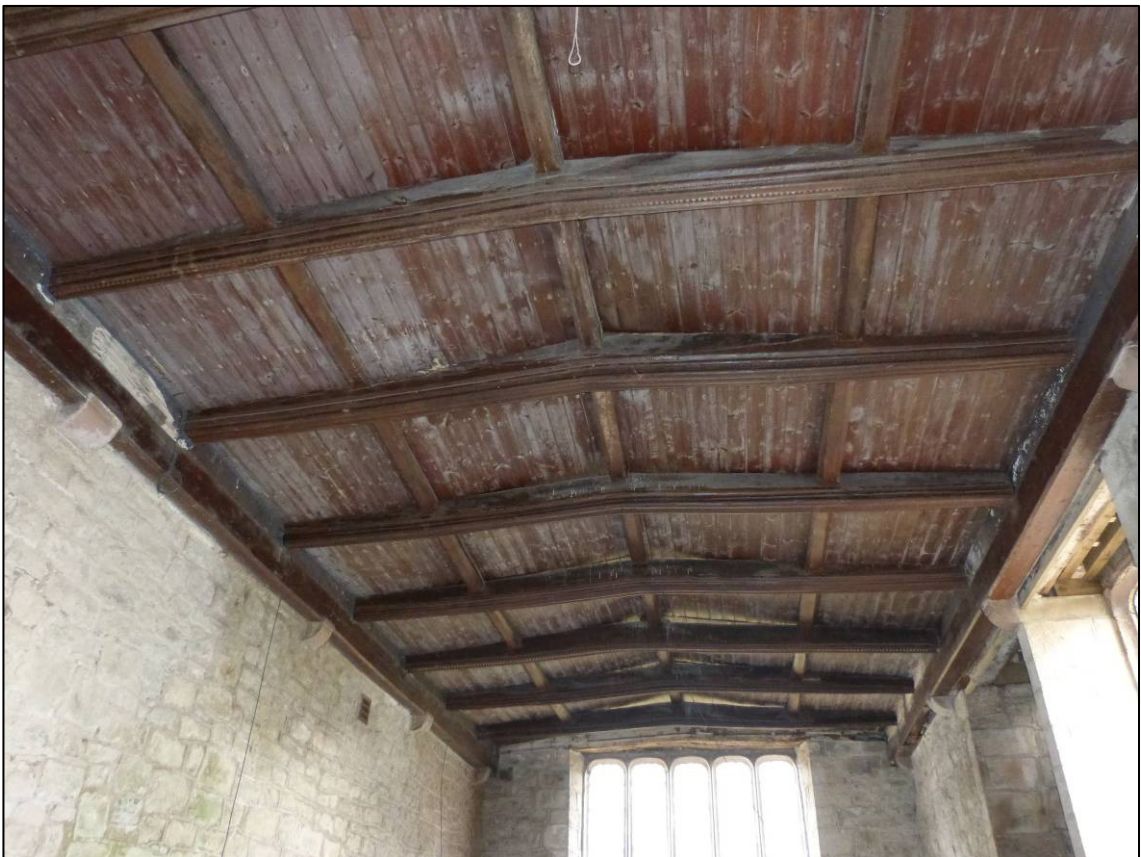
Chapel, roof structure, looking NE (photo 5/896).
